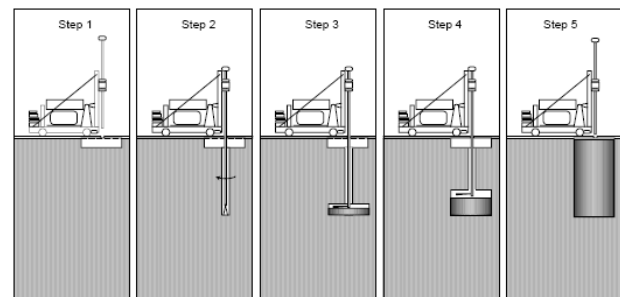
Step-by-step construction of soil cements columns by means of jet grouting technique.
